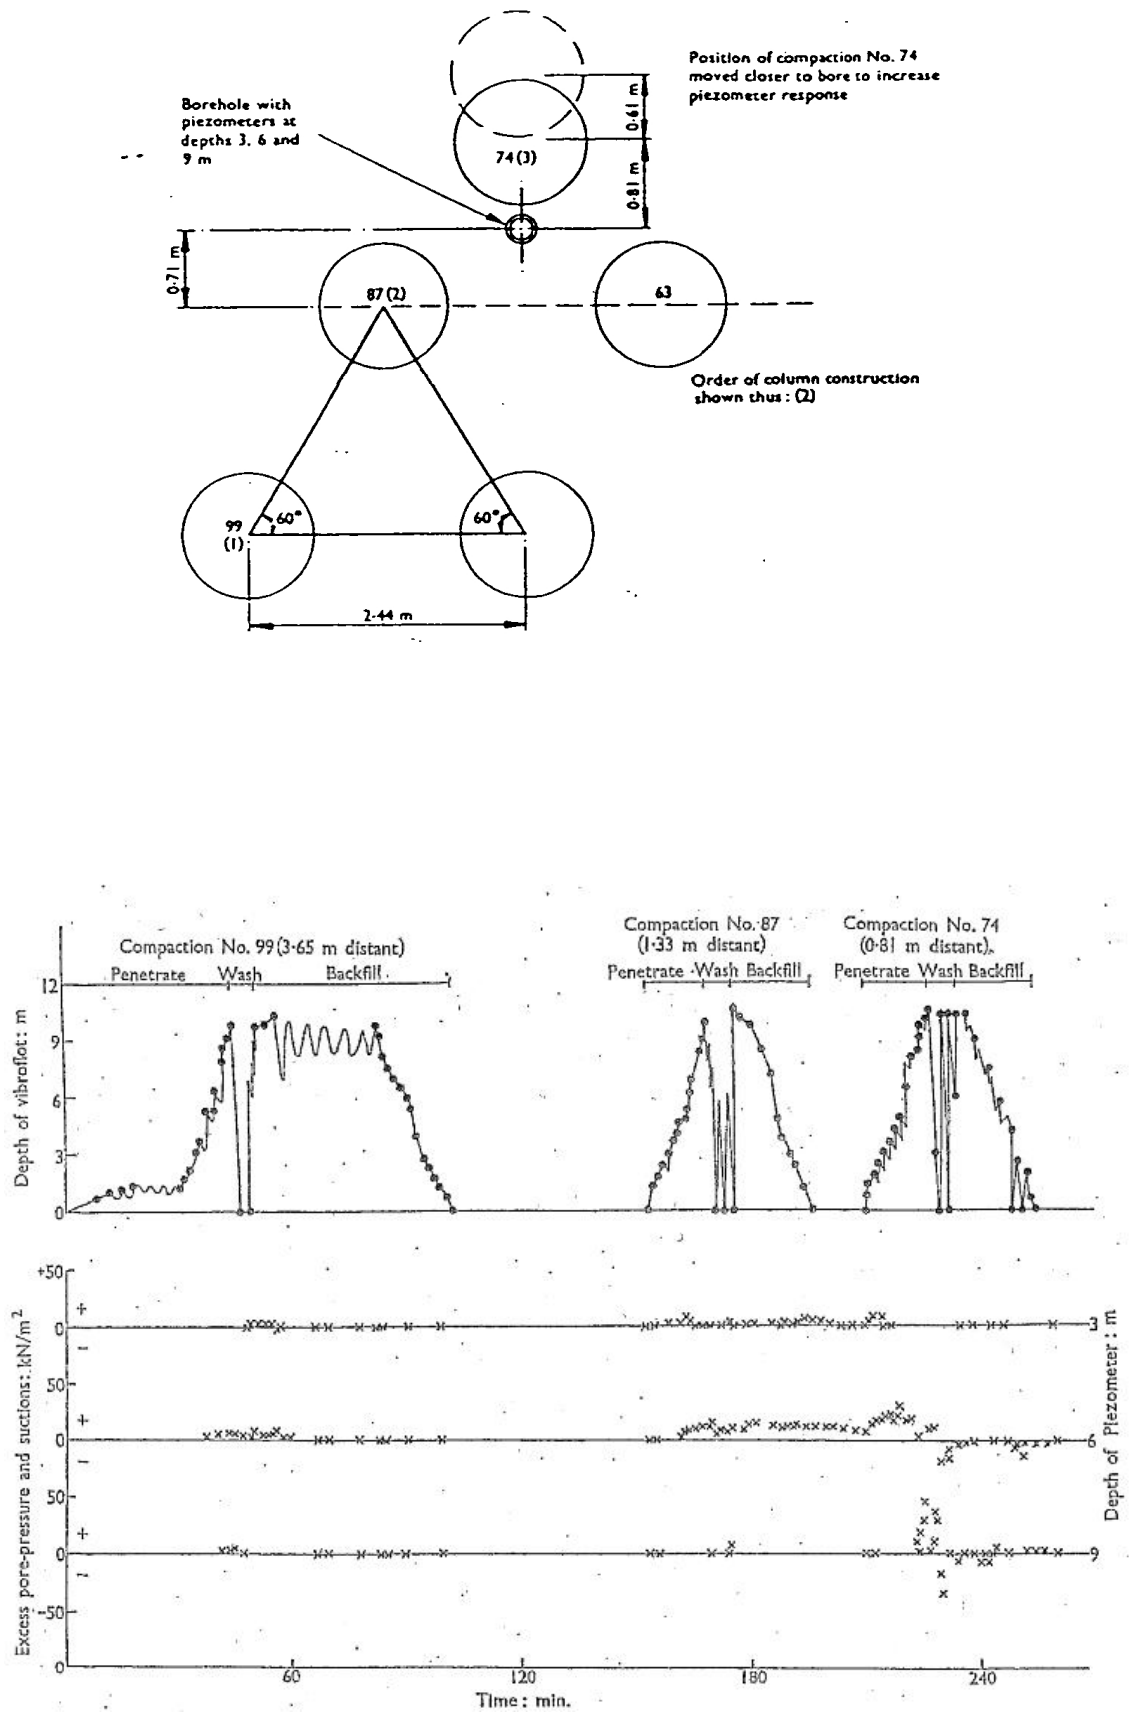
East Brent trial embankment. Plan of instrumentation and piezometric observations during stone column construction (after Greenwood, 1976b).
